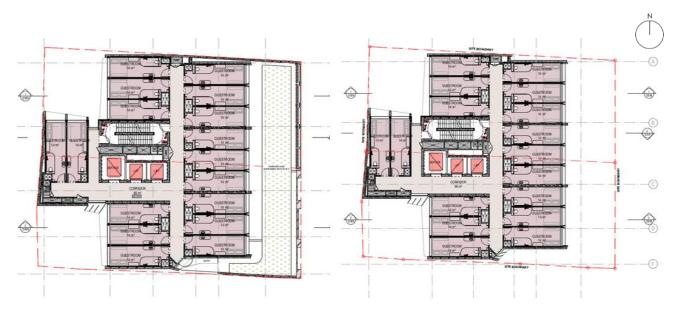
Original Scheme (11 May 2022), Proposed Level 6 Plan (left) and Typical Tower Plan (right)
